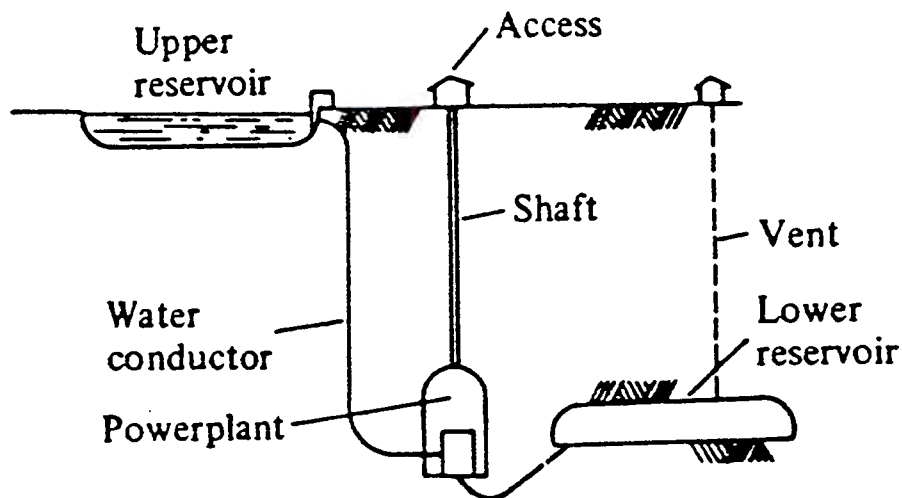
Schematic layout of a pumped hydro storage plant with underground storage⁽⁴⁾
